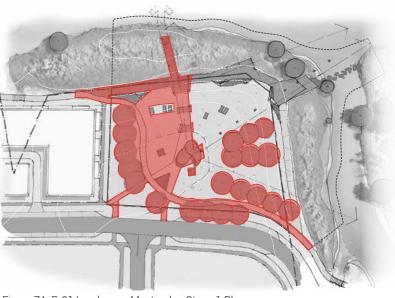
A: F-01 Landscape Masterplan Stage 1 Plan
